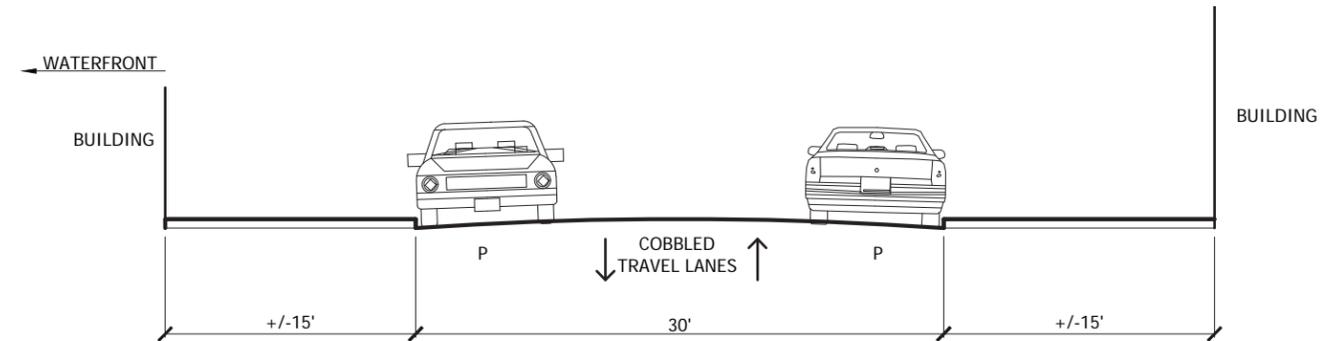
Existing configuration on Beard Street between Conover Street and Erie Basin Park
